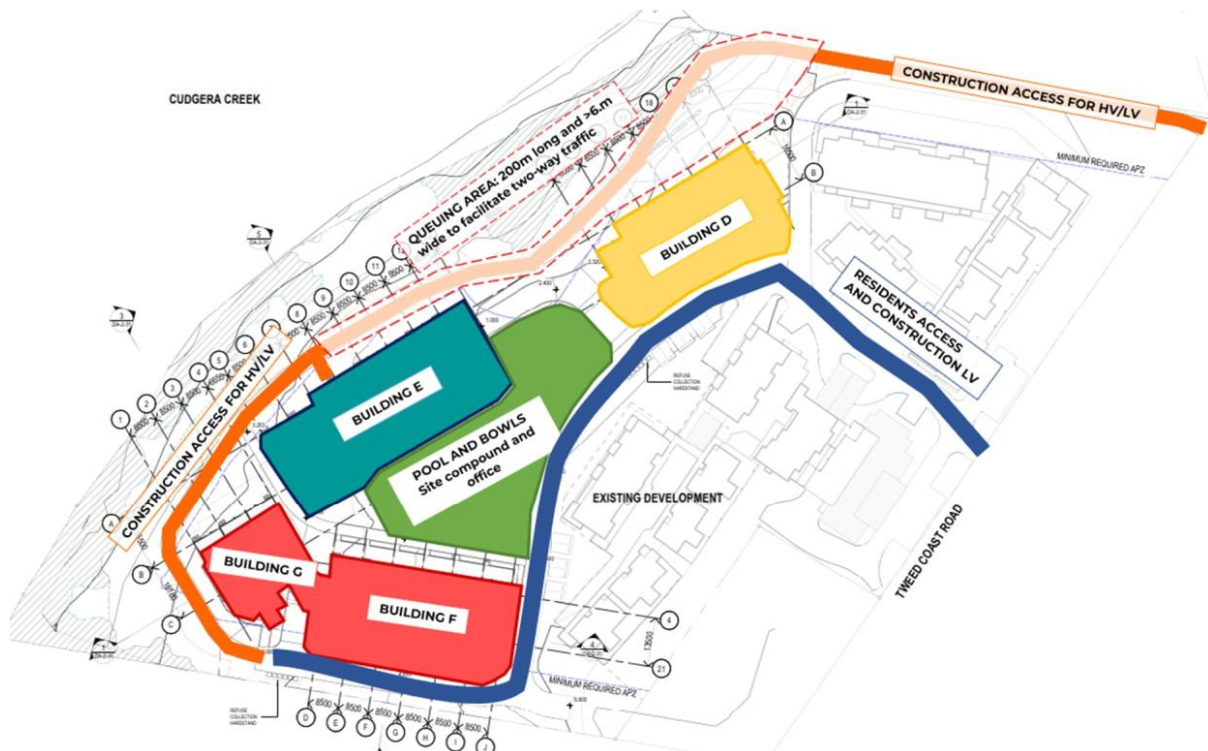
| Construction Vehicle Movements (Source: Planit Consulting)
